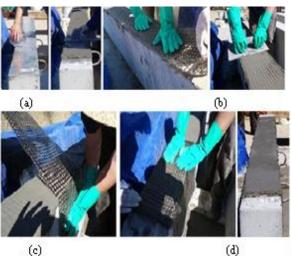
Beam strengthening steps: (a) application of water and the first layer of mortar respectively, (b) Placing the textile grid and troweling it in the mortar, (c) Installing the grids across the beam for better bonding of TRM on main span, (d) strengthened beam appearance
